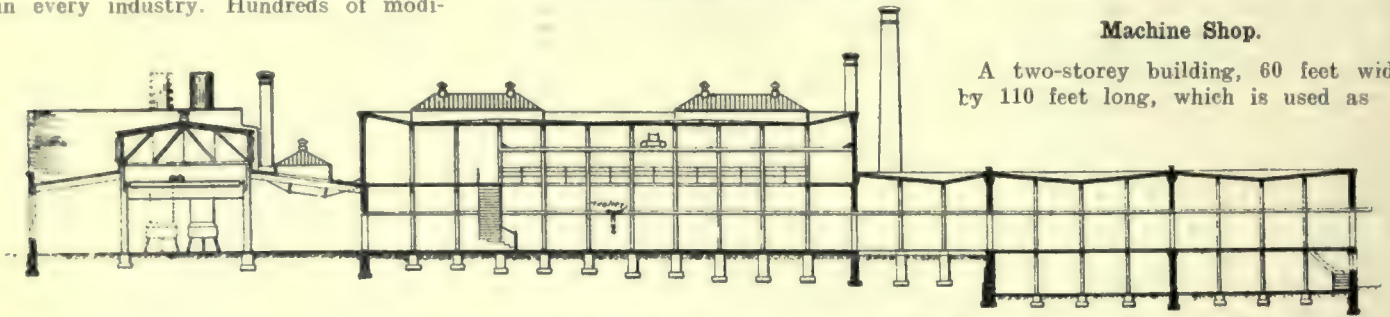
Longitudinal Section E. & T. Fairbanks Plant, Sherbrooke.
